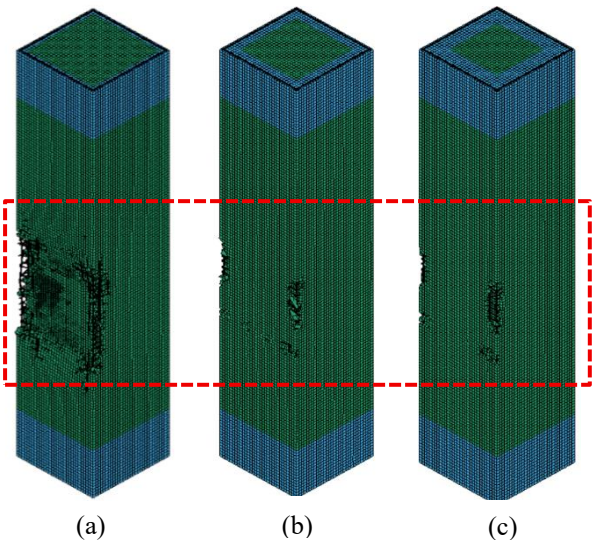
Damaged level at impact location for jacketing thickness of (a) 200 mm (b) 400 mm and (c) 600 mm
